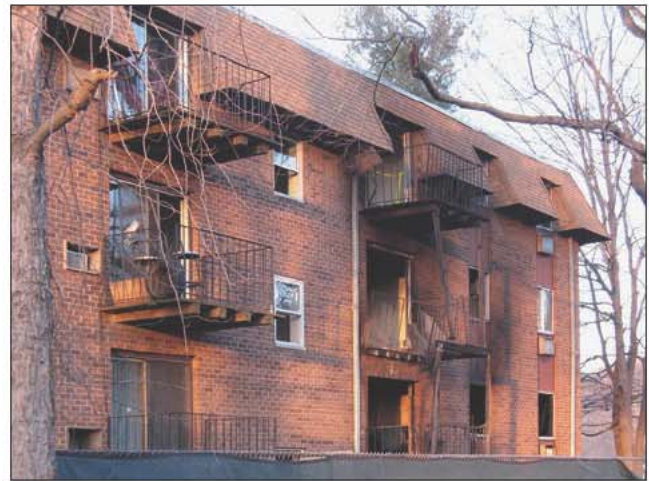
Condominiums and townhouses. Both of these occupancies normally consist of a common attic that may have draftstopping or fire walls constructed within them and are supported by dimensional lumber or pre-fabricated truss roof systems.
